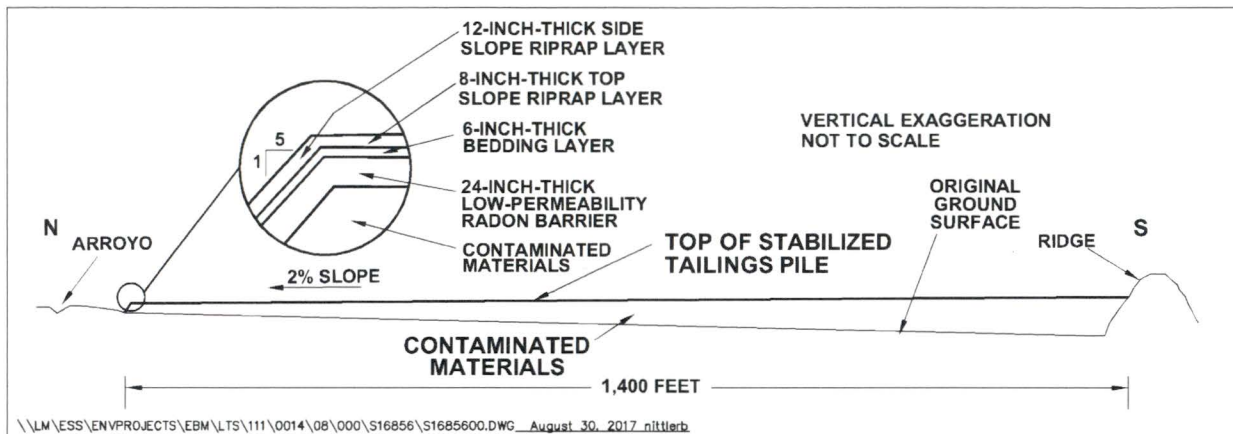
Typical North-South Cross Section of the Mexican Hat Disposal Cell
